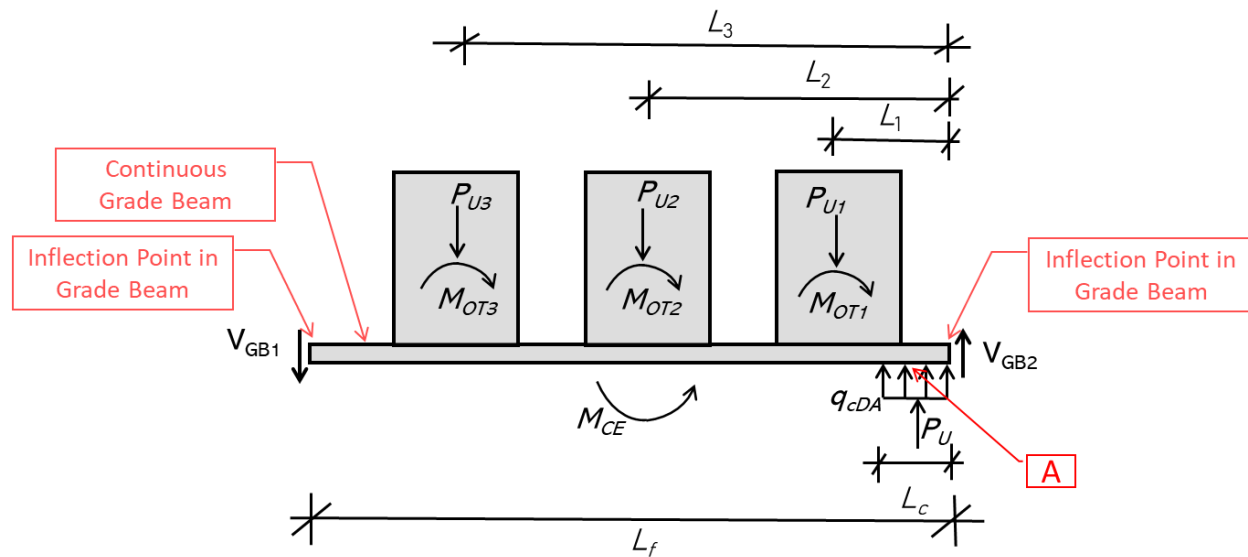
Overturning and resisting forces on an isolated footing supporting multiple structural members.
